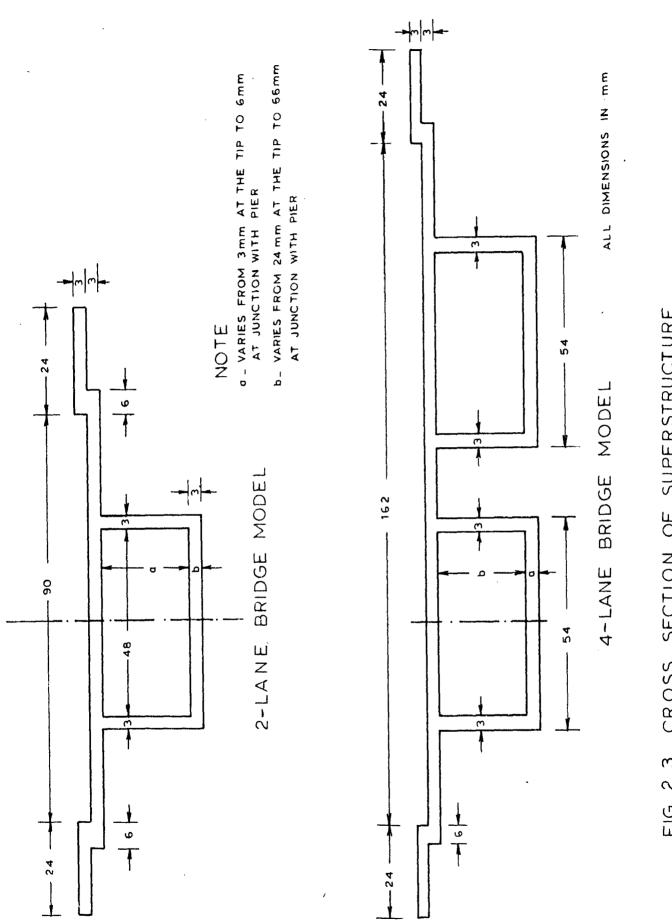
CROSS SECTION OF SUPERSTRUCTURE
